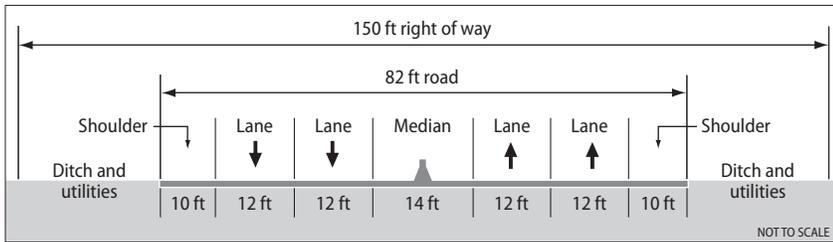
Typical cross section of SR 502 under the Build Alternative
